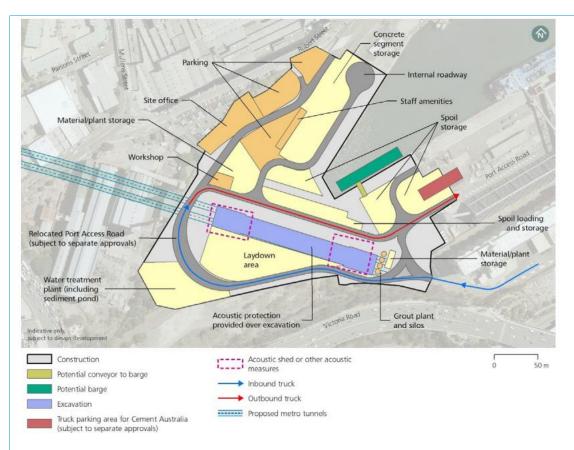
The Bays station construction site – footprint and indicative layout (Figure 9-30 of the EIS)
